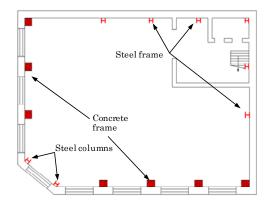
Floor plan of TSB Bank Building, showing retrofit
